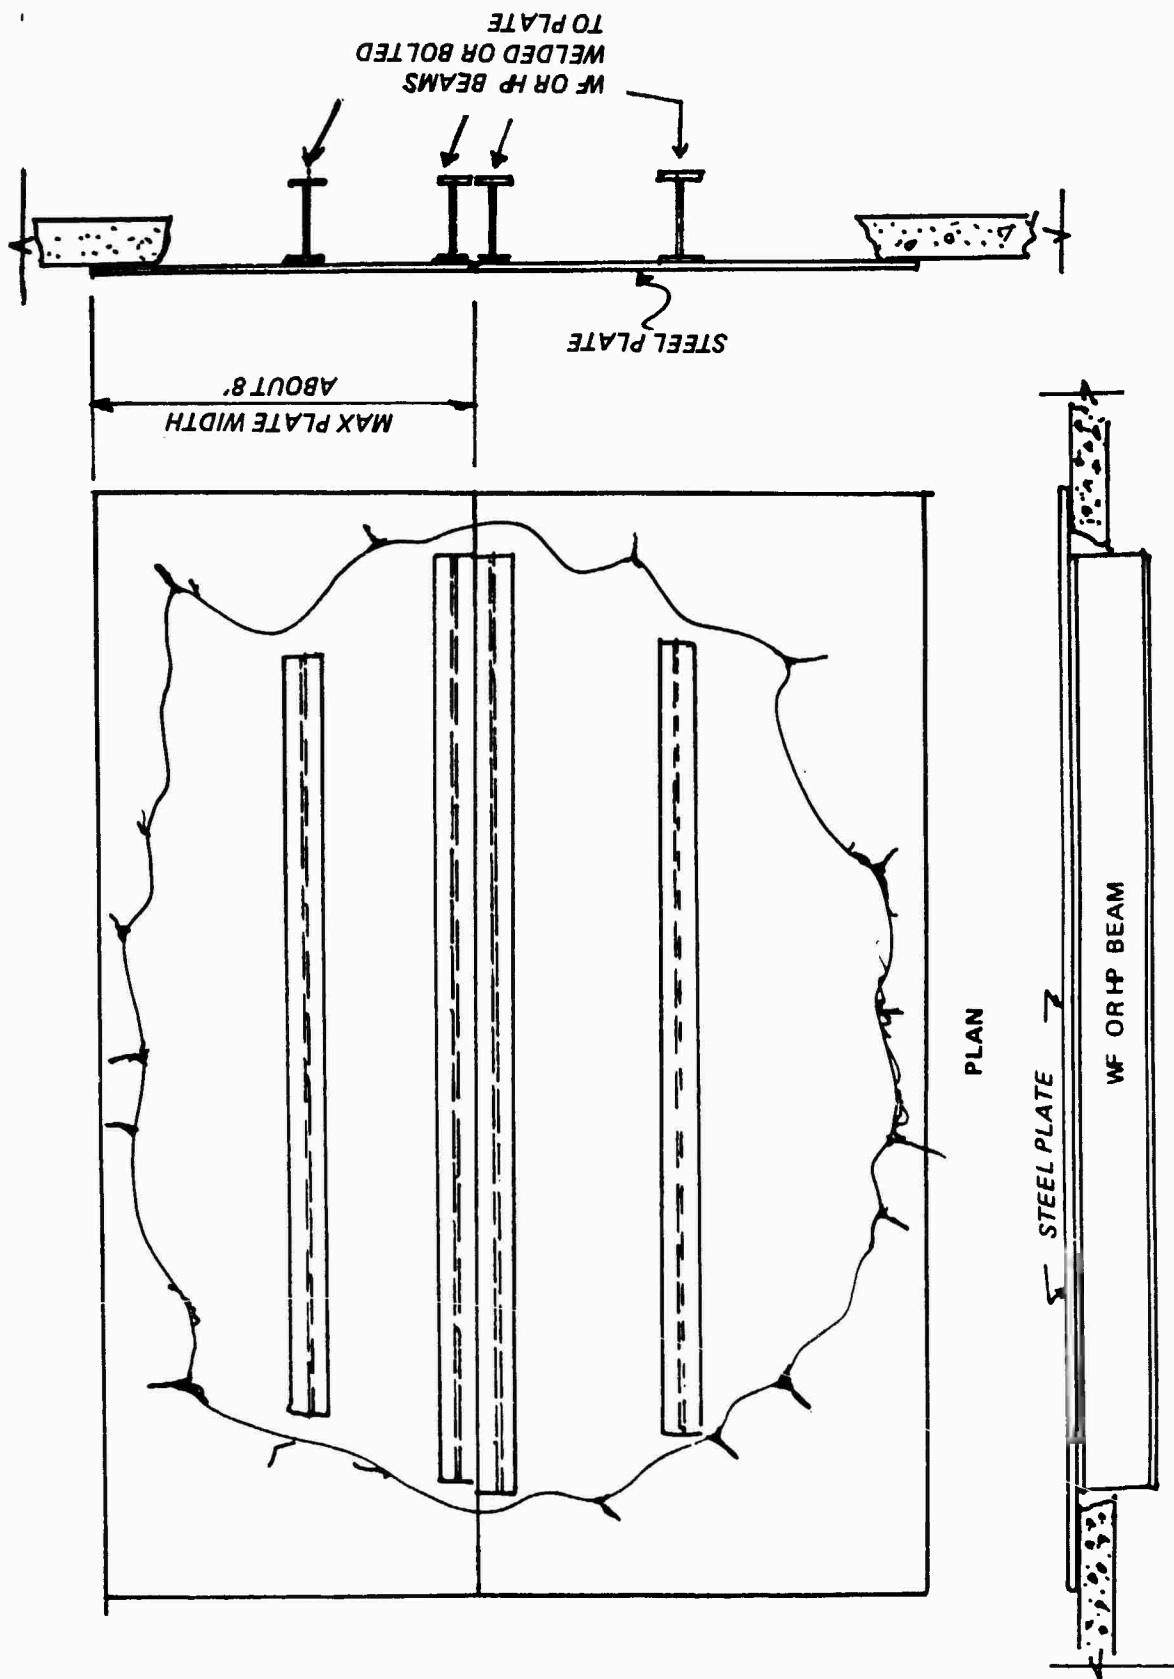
Repair using steel plate reinforced by steel beams (Reinforced plate subconcept)
